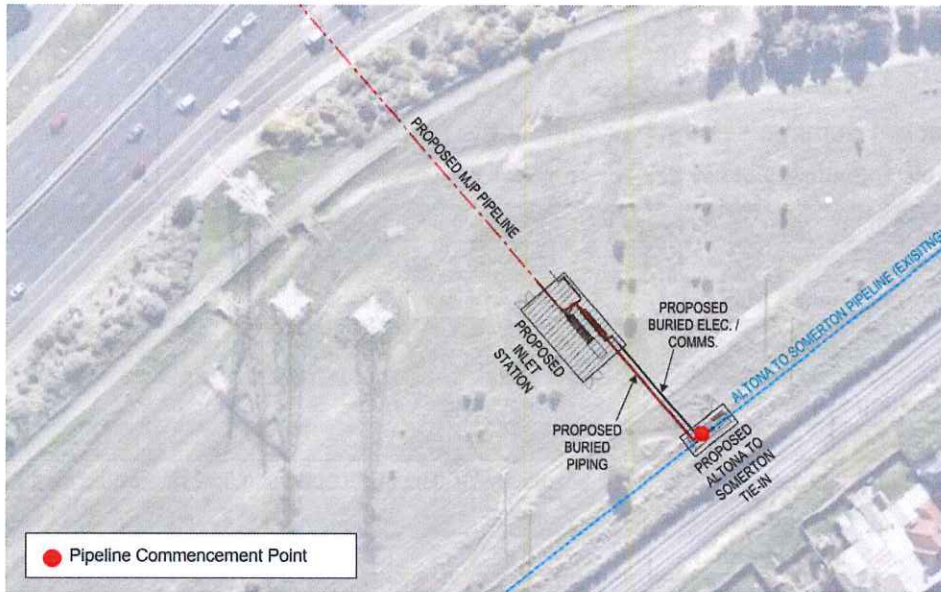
Plan view - pipeline commencement point and the proposed buried piping section of piping between the tie-in pit and the inlet station
